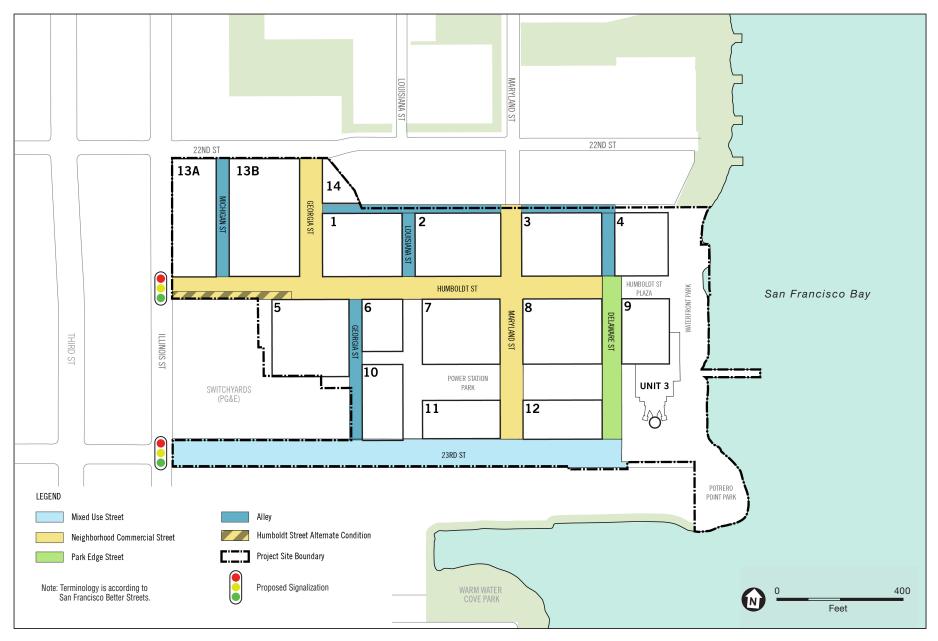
shows the proposed street plan. The north-south streets include Michigan, Georgia, Maryland, and Delaware Streets, which would connect the project site to 22nd Street; Georgia, Maryland, and Delaware Streets would connect to 23rd Street, although Georgia Street would be slightly offset at Humboldt Street before connecting to 23rd Street. East-west streets include Humboldt and 23rd Streets, which would connect
